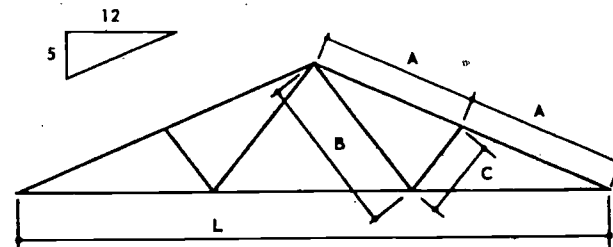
Standard W or Fink truss commonly used in residential construction.
